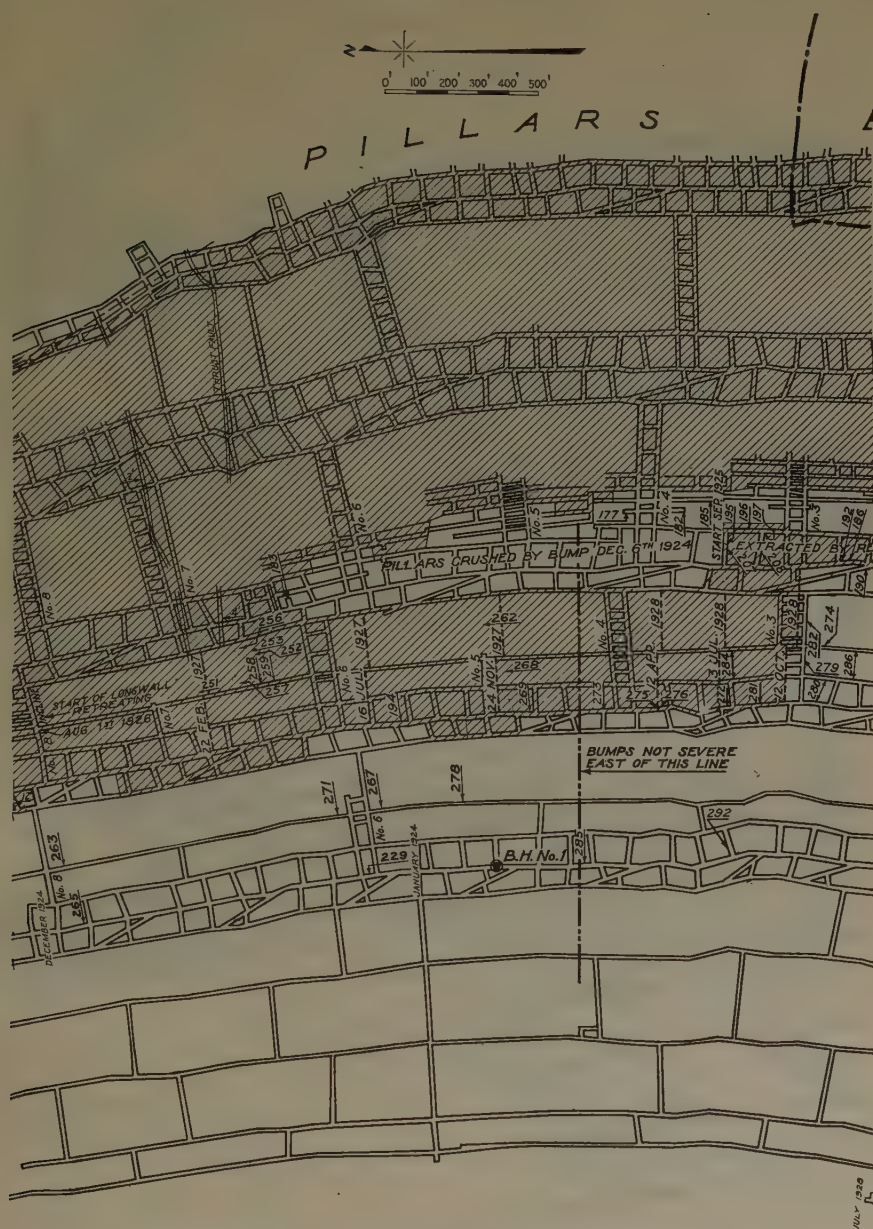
PART PLAN OF No. 2 COLLIERY, SPRINGHILL, N. S.
